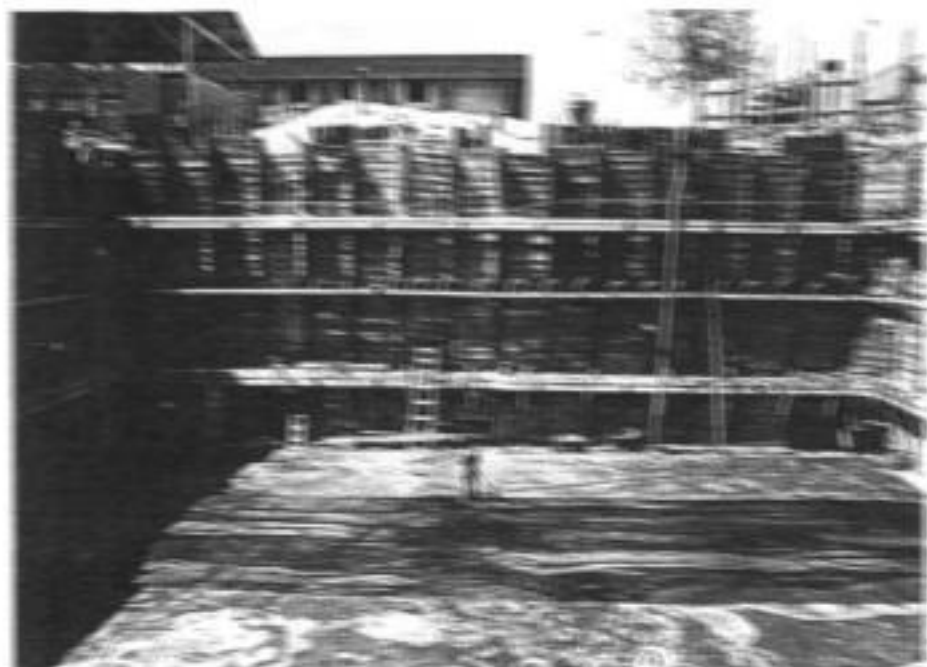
Slab wall method using some access doors and horizontal ties supports with wallpoint reinforcement to a concrete construction of 4-meters. Saudi Arabia courtesy of Slab.
